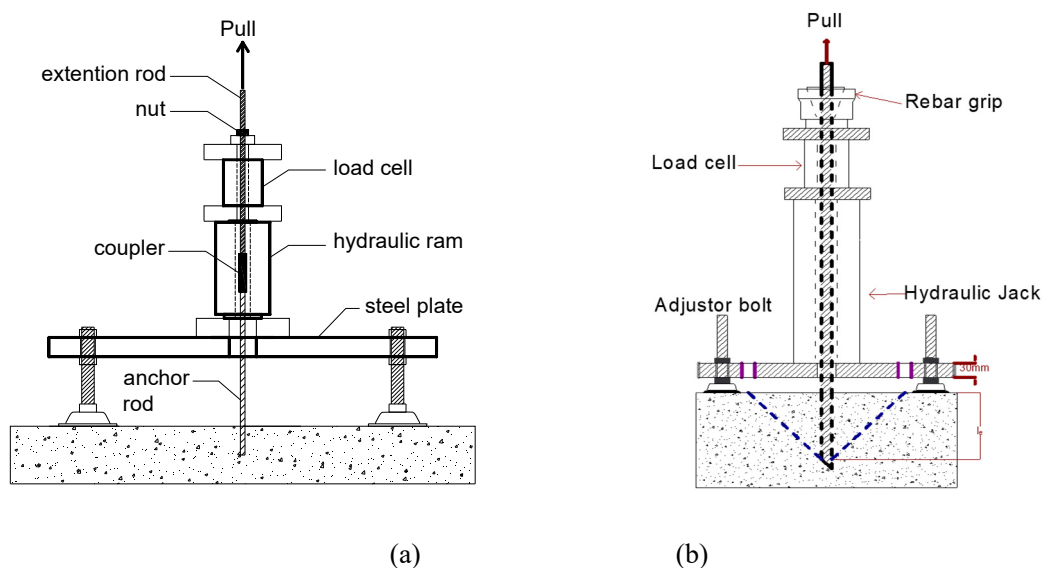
Test set up of pullout test to determine tensile capacity of (a) anchor in RC slab and (b) rebar in pure low strength concrete
